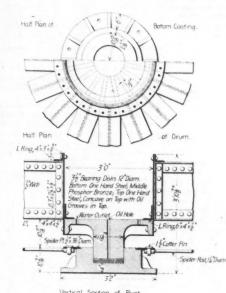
Turntable and Center Pivot Construction for Grand Trunk Ry. Bridge Over Trent Valley Canal.
